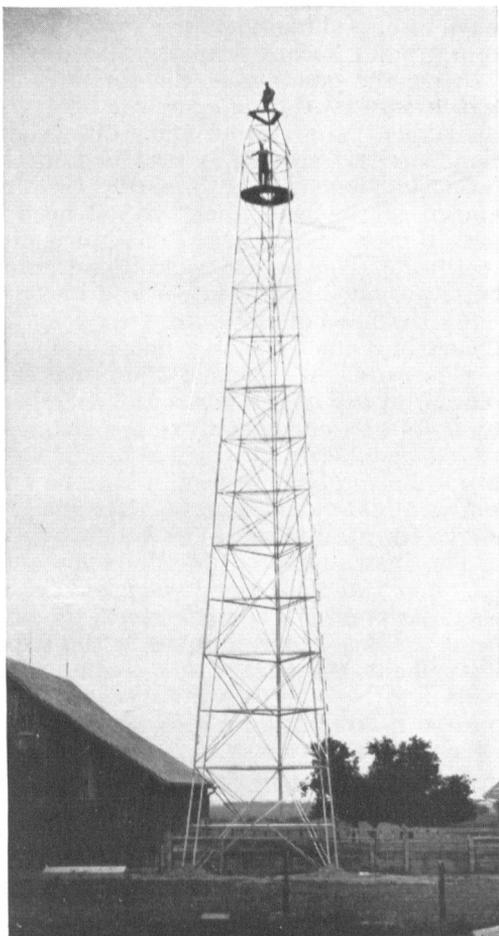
Ninety-foot Bilby steel tower, complete.
